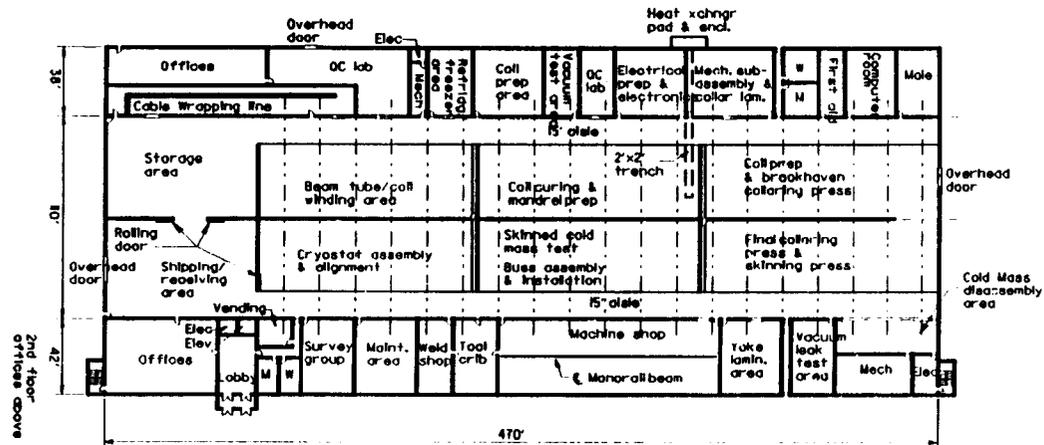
Schematic Site Plan - Magnet Support Facilities Complex
